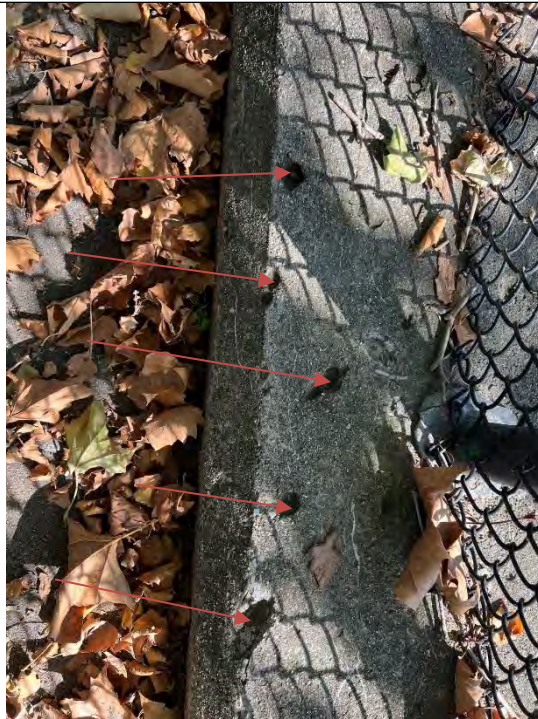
Pitting in Top of Concrete Seating Area Wall
